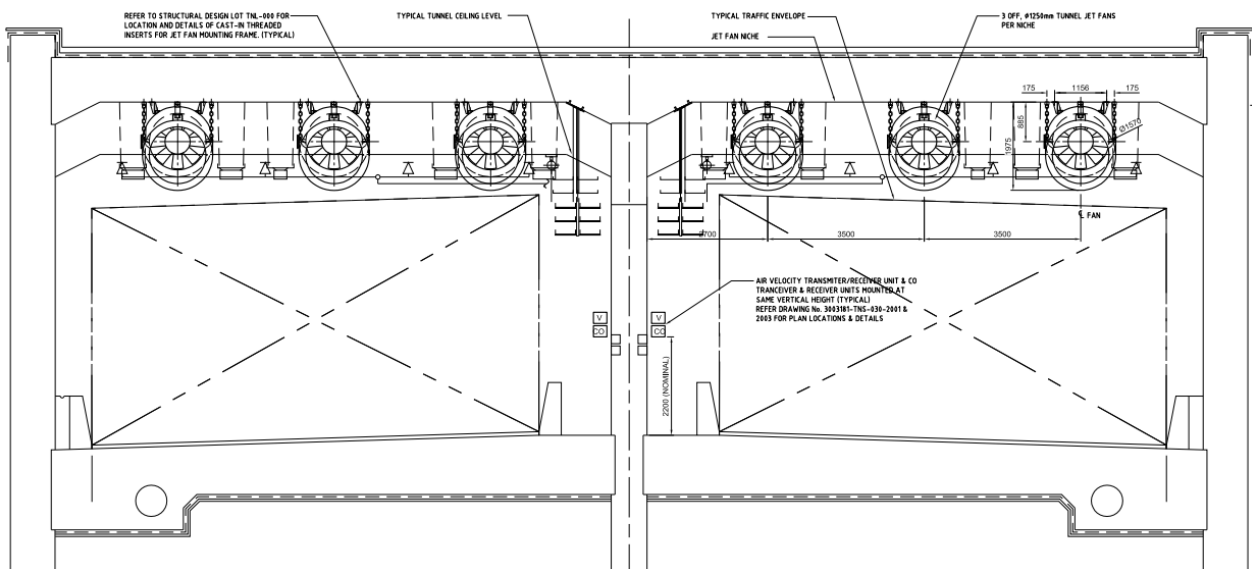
Typical Section for Cut and Cover Tunnel – Tugun Bypass
